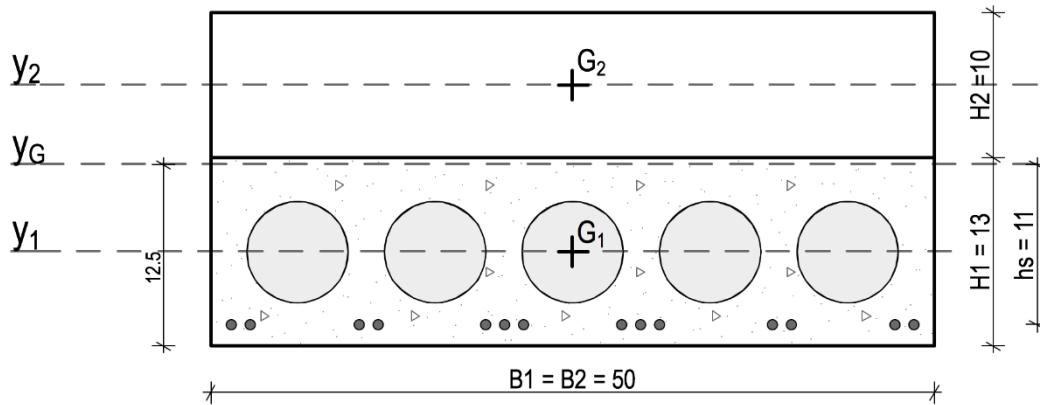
Castellated slab and upper screed sections with details of axes for second area moments calculation.
